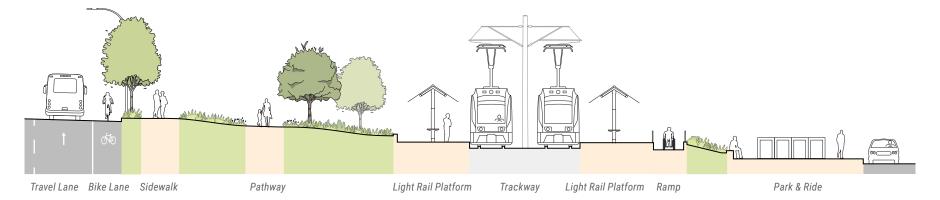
DRAFT 68th Parkway Station Cross Section
